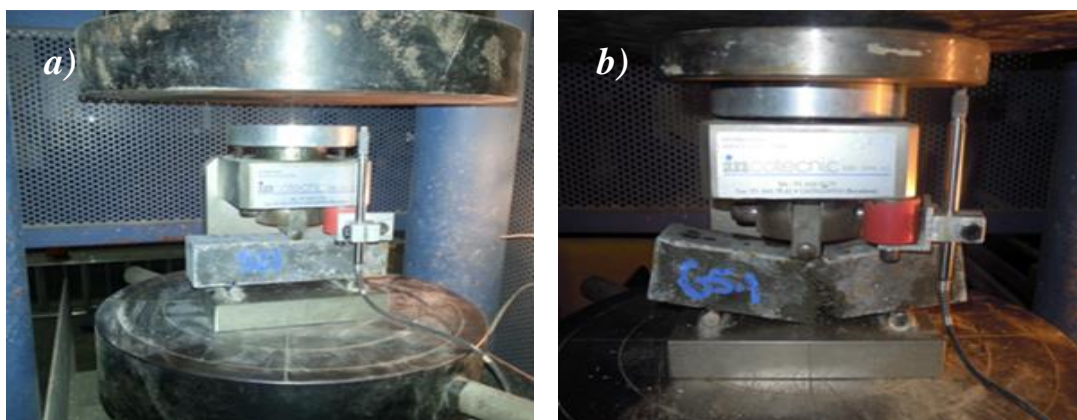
3-point bending test: a) specimen in the apparatus for the test and b) specimen failure after the test.
